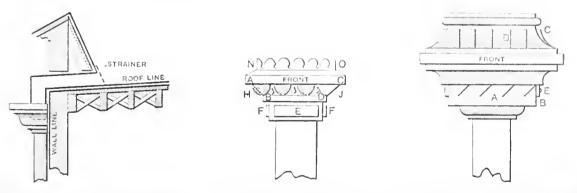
Section Showing a Valley Connected to an Elbow Passing through the Wall of a Building into a Leader Head.
